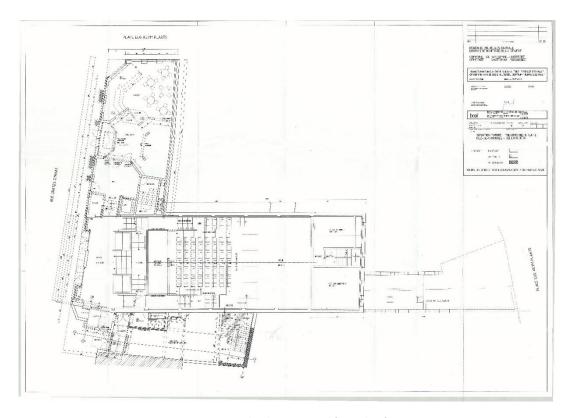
Espace Paul Delvaux ground floor plan from 1999
